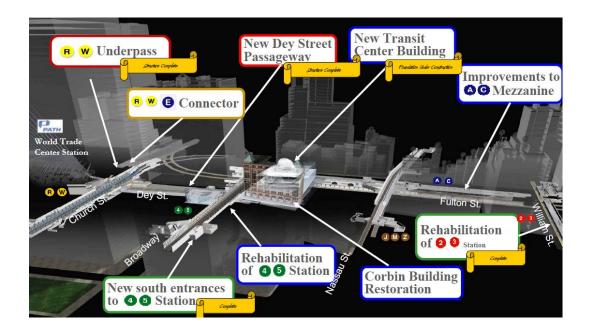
The proposed sub-surface expansions in the Fulton Street Station (image: www.mta.info. Last accessed on 09.03.2010)
